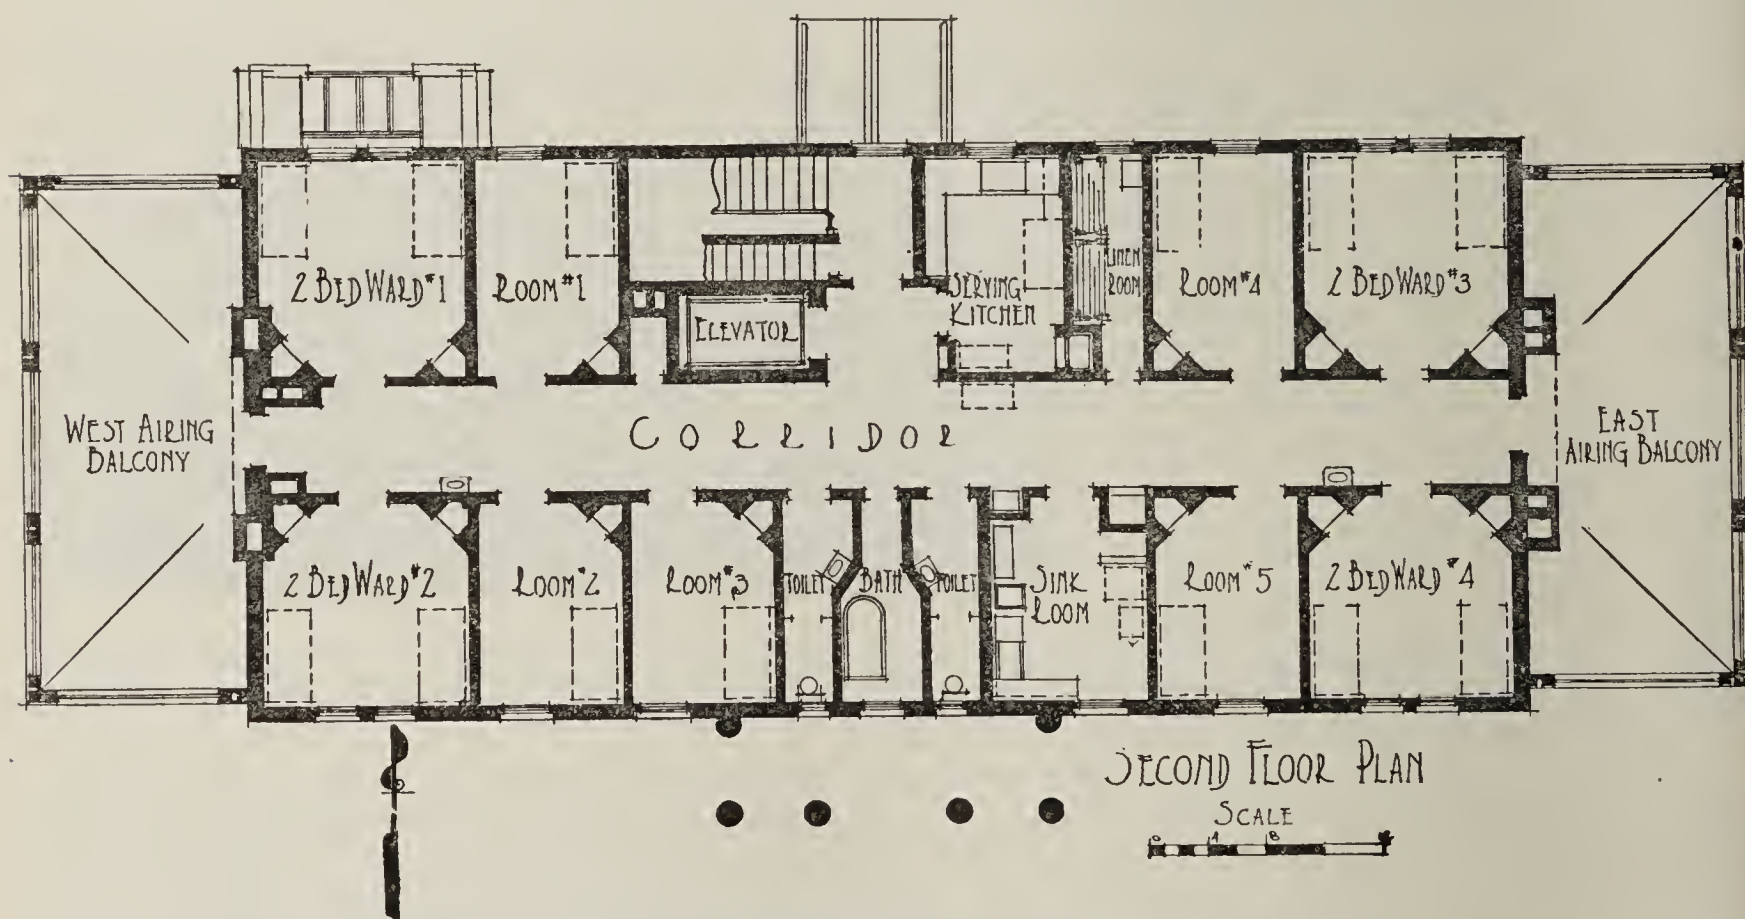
Second floor plan: Attention is called to central location of stairway, elevator, serving kitchen, toilets and bath, there are five private rooms and four two-bed wards; at each end is a large airing balcony.
